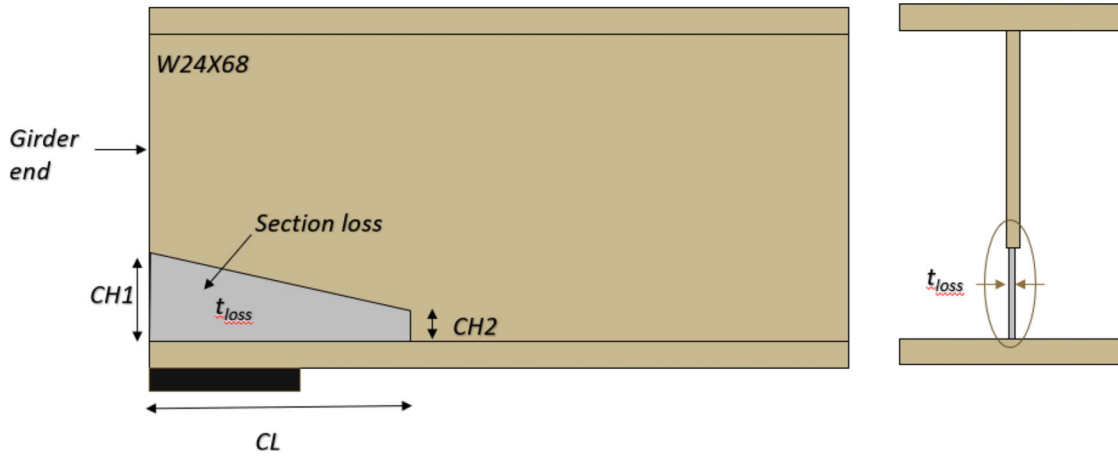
Schematic of girder with trapezoidal corrosion pattern.
